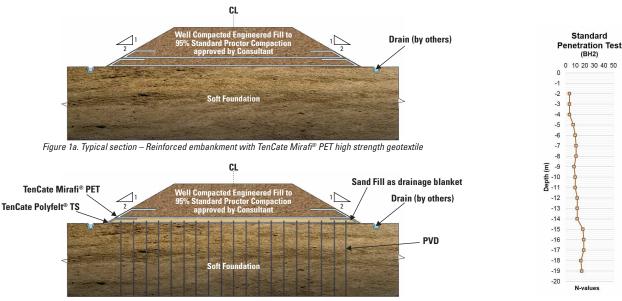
Typical section – Reinforced embankment with TenCate Mirafi® PET high strength geotextile and Prefabrication Vertical Drain (PVD)
